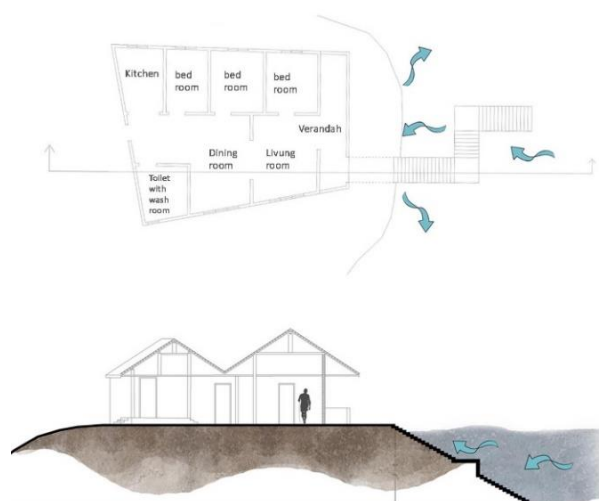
Floor Plan and Cross Section showing movement of flood water and level of inundation in Case 4 (Source: Henarangoda, 2020)
